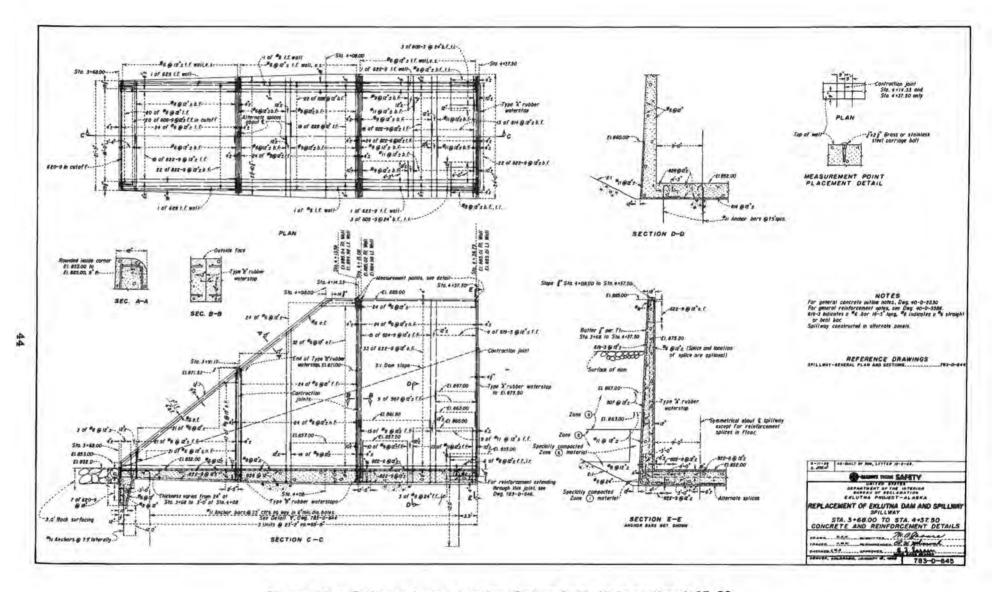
Spillway design details -- Station 3+68. 00 to station 4+37. 50.
